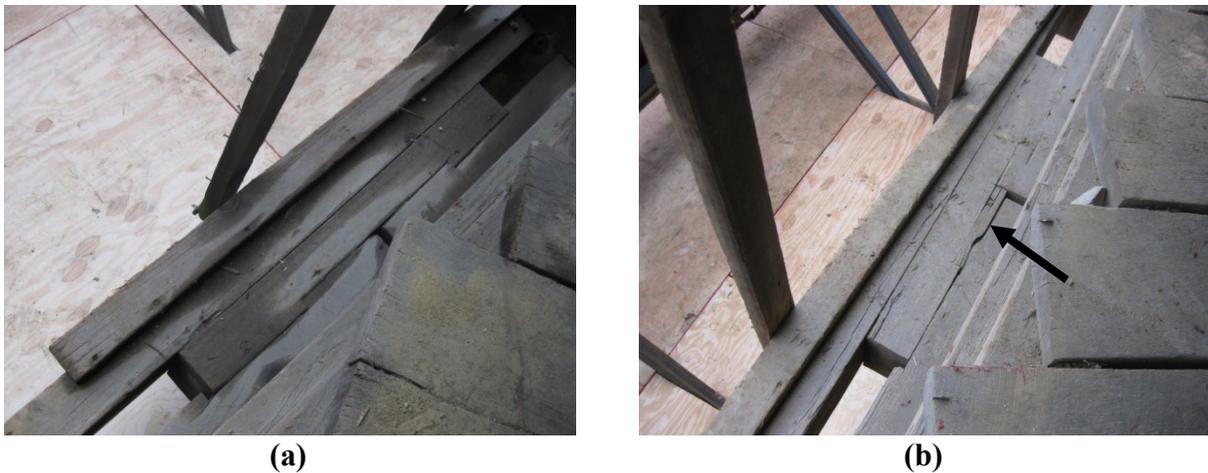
(a) Original lower tension splice in Gilpin's Falls Bridge and (b) typical shear failure of a tension splice (note the movement of the lower chord due to joint failure). Photographs by Rachel H. Sangree.
